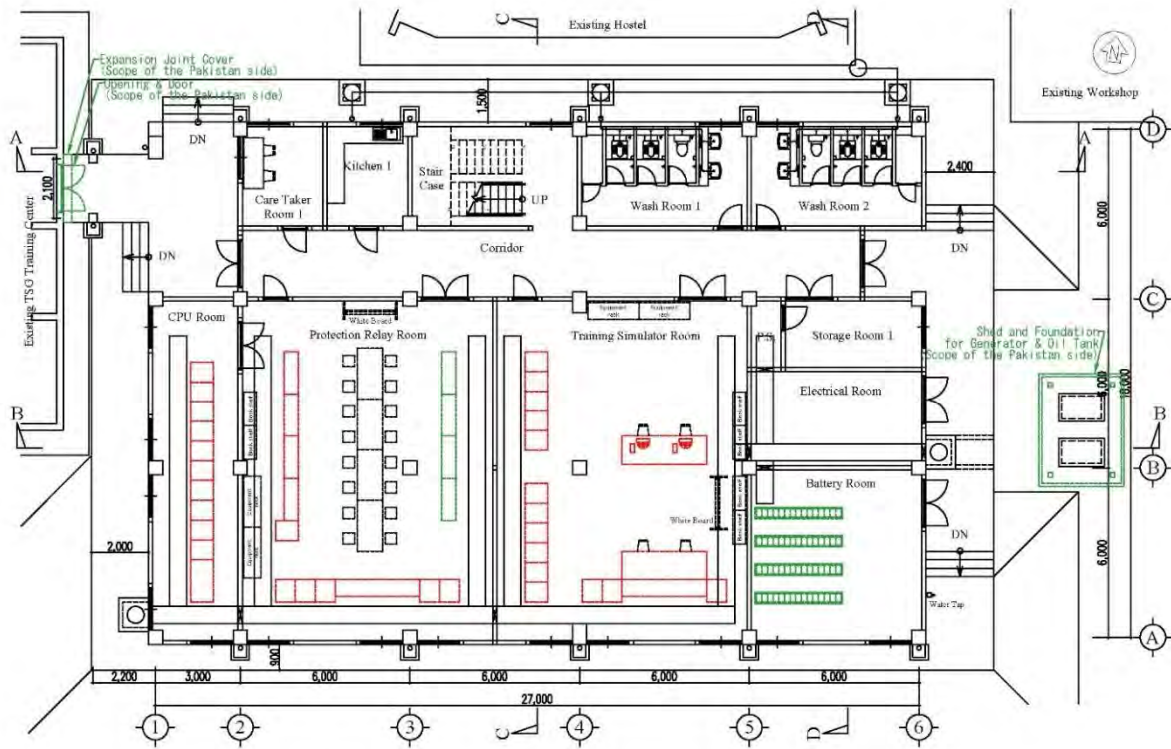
Ground Floor Plan of the New Training Simulator Building
